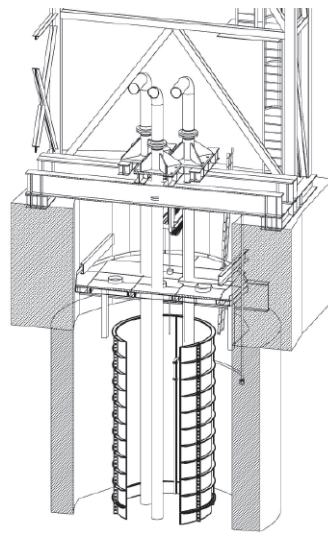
Variant 2 – pump pipe constructed using split-type lost formwork. Bild 6. Variante 2 – Herstellung einer Pumpenröhre mit Einsatz einer geteilten verlorenen Schalung. Source/Quelle: RAG
